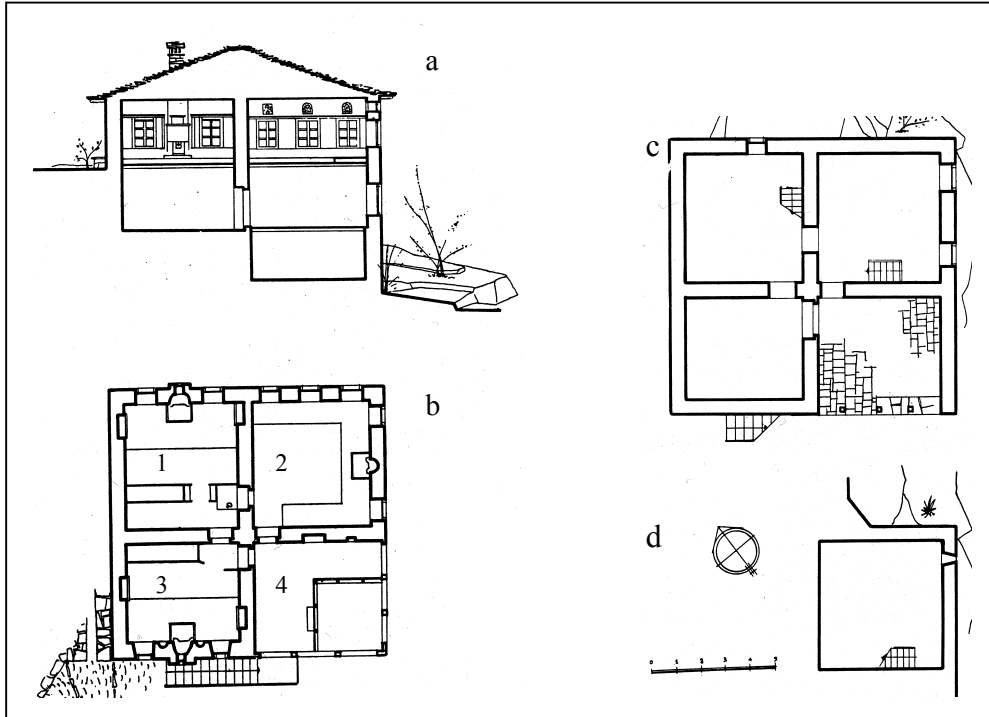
An archontiko in Metsovo, province of Ioannina: a) section; b) second floor: 1. gonaio, 2. chotzares, 3. serai, 4. ondas; c) first floor; d) ground floor (Charissis 1960: 245 & 246, fig. 22 & 23).
